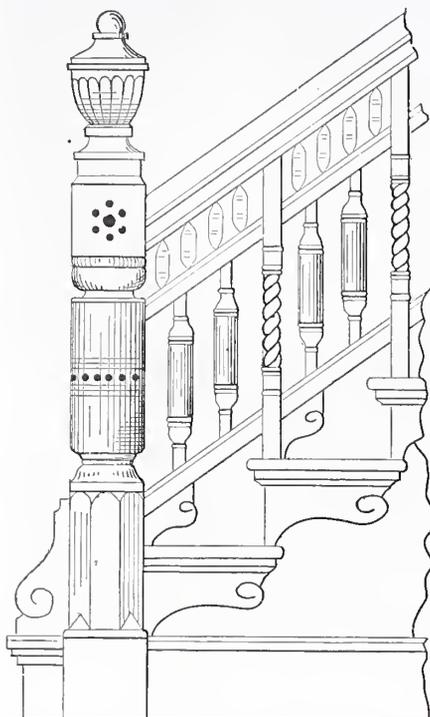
Elevation of Newel Post and Balusters, Front Stairs.—Scale, $\frac{3}{4}$ Inch to the Foot.
